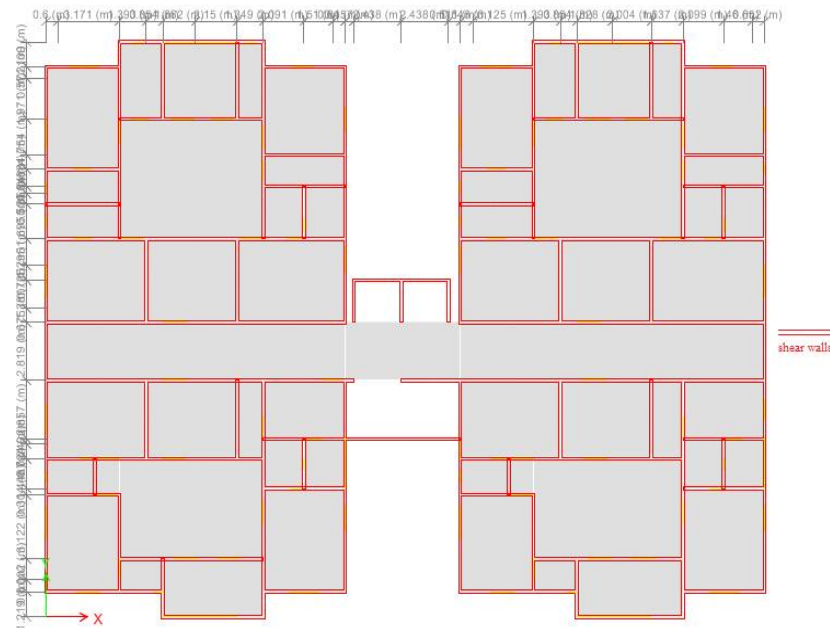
Typical shear wall layout plan of 18storeyed residential building
